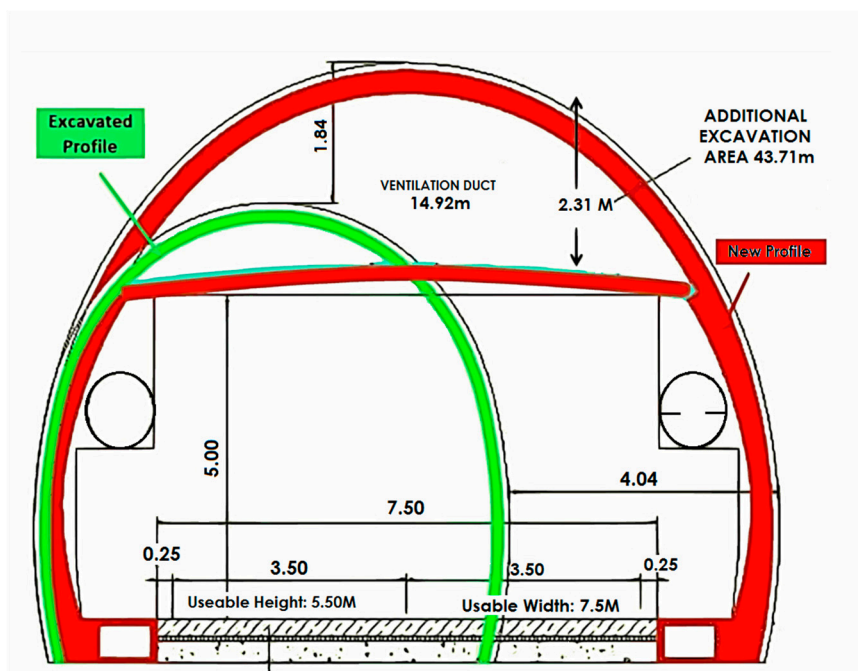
Conceptual illustration of tunnel profiling. The original tunnel concept with a piggy-back rail tunnel with a cross-sectional area of 45 m² is shown in green, whereas the widening tunnel cross-sectional area of 85 m² is shown in red.
